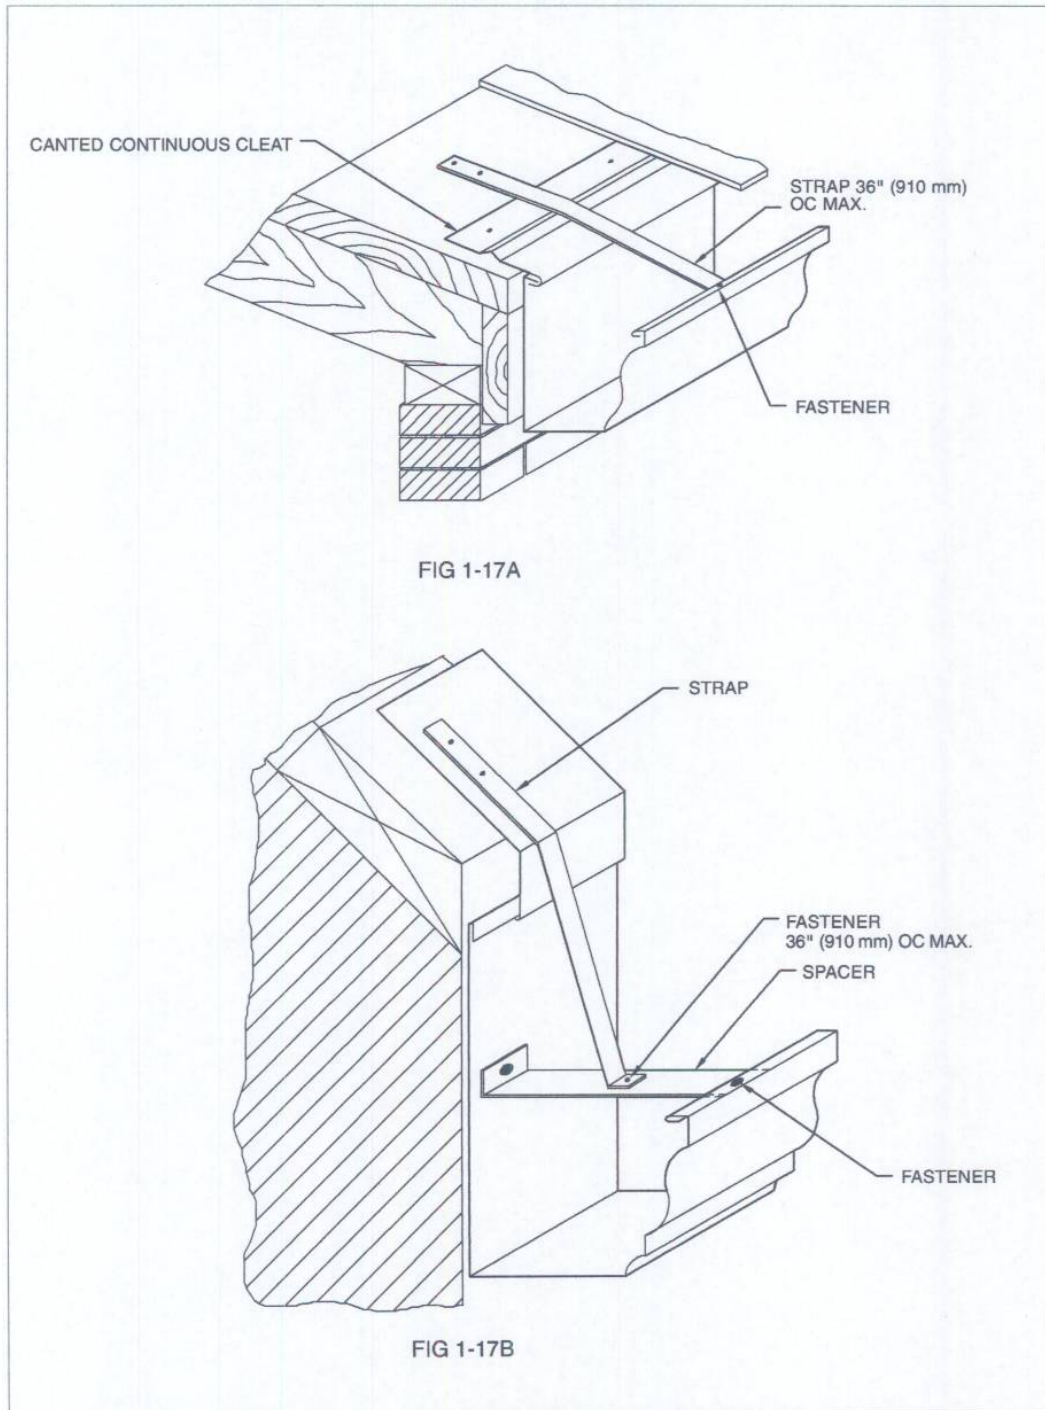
HANGING GUTTER INSTALLATIONS — SLOPED ROOF
